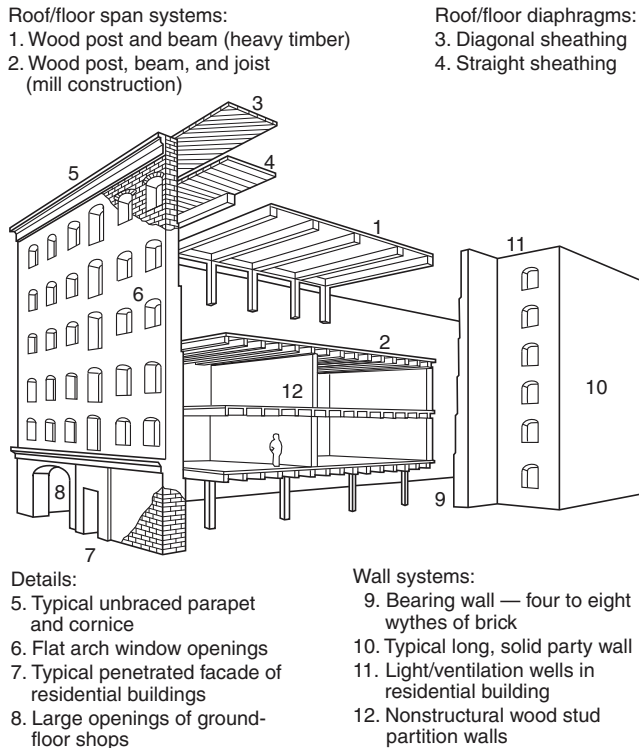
(n) Unreinforced Masonry Bearing Wall, Example 3 of 3.
